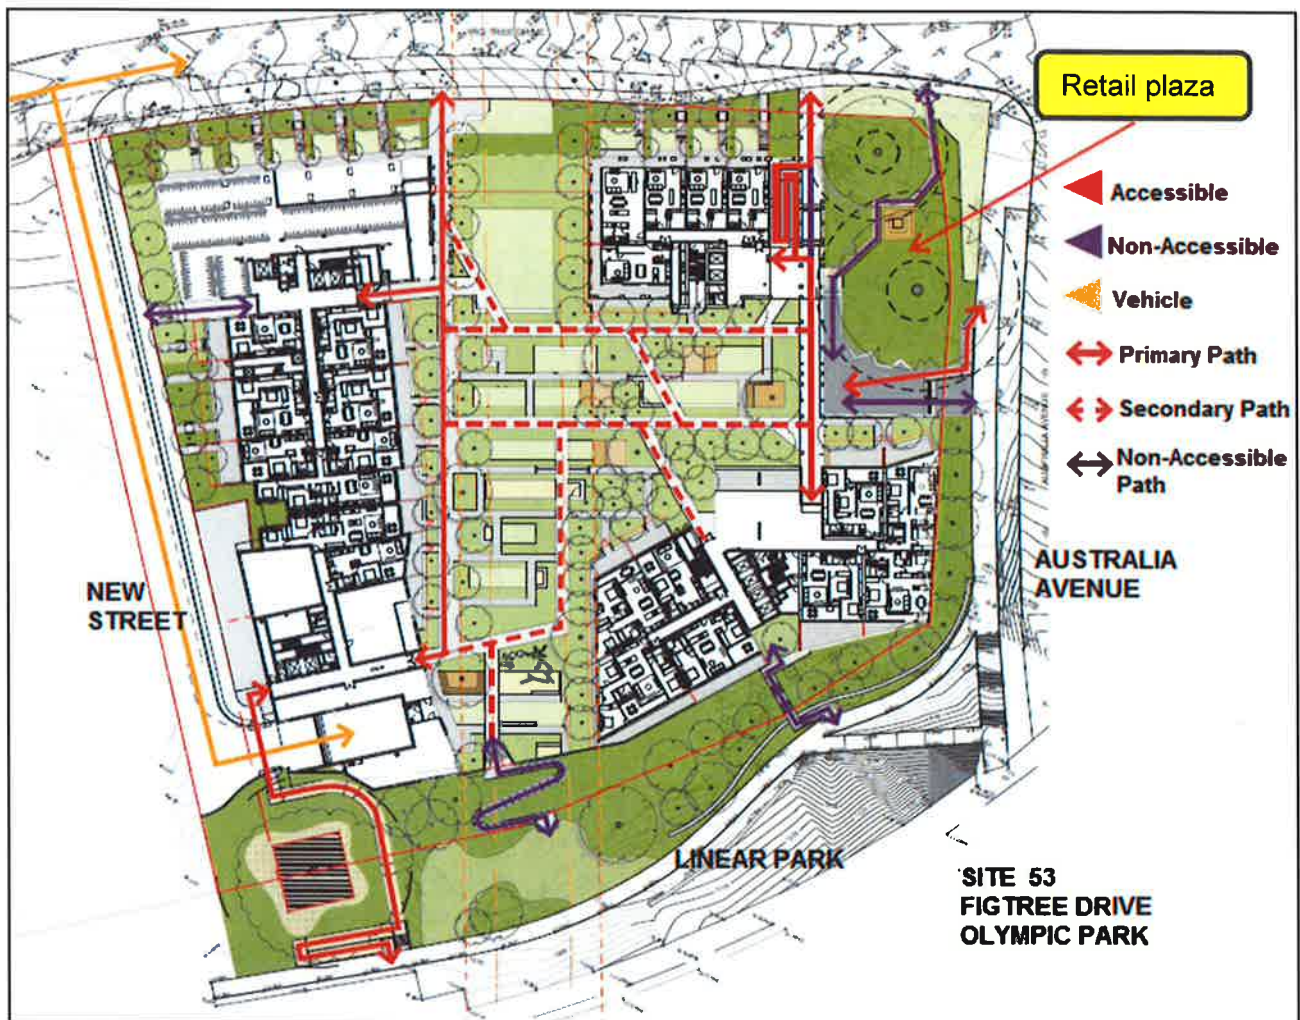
Accessibility through the site to buildings, open space and Linear Park (Source: EIS)
